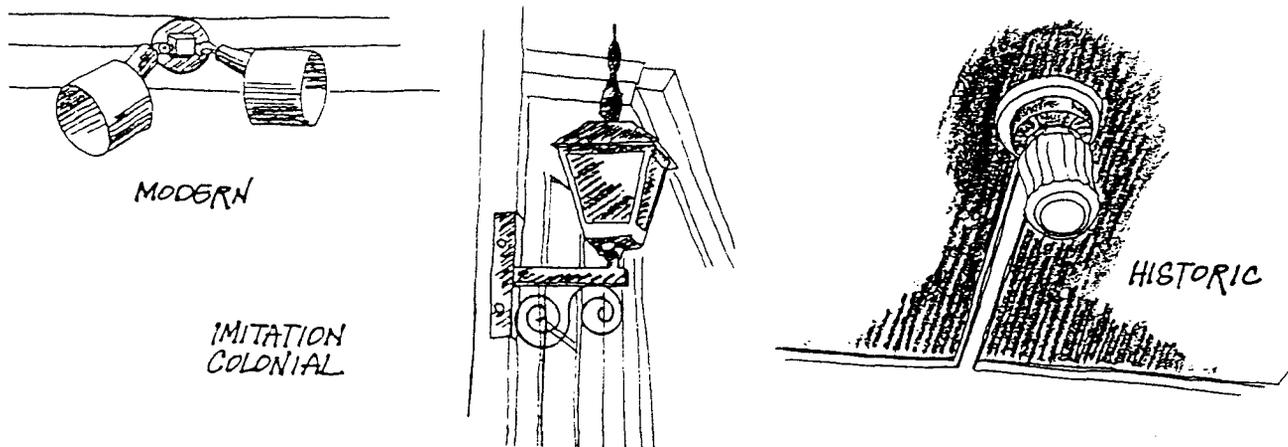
EXAMPLES OF BUILDING LIGHTING FIXTURES
